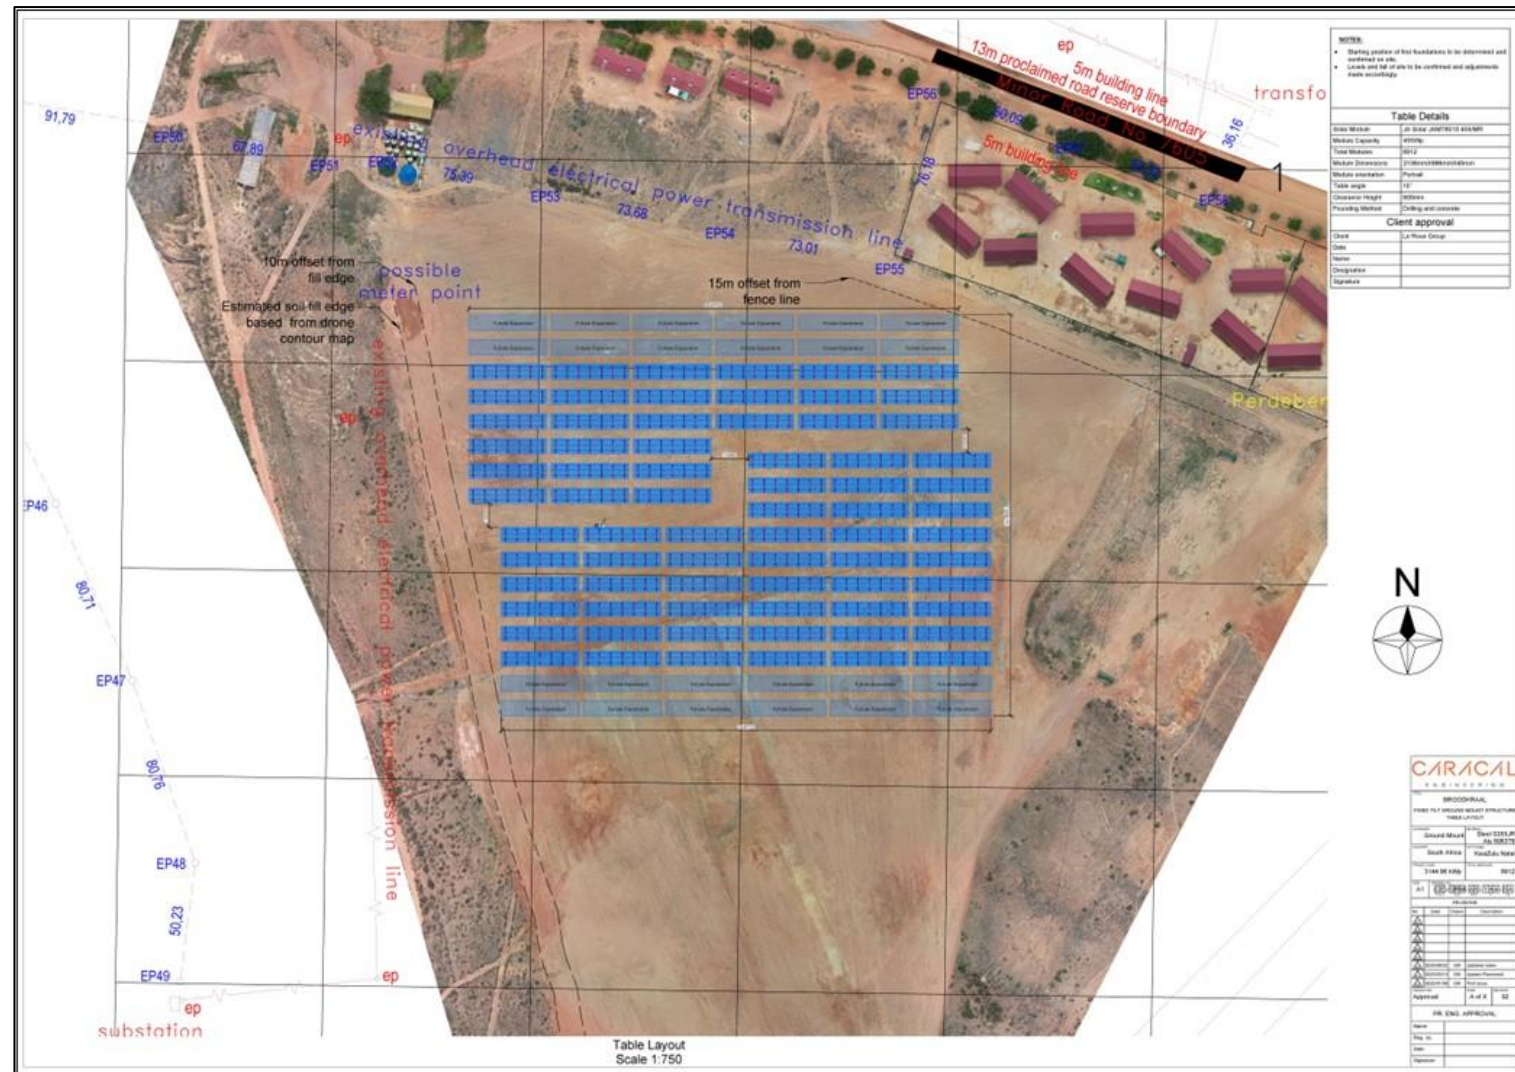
PROPOSED DEVELOPMENT PLAN
